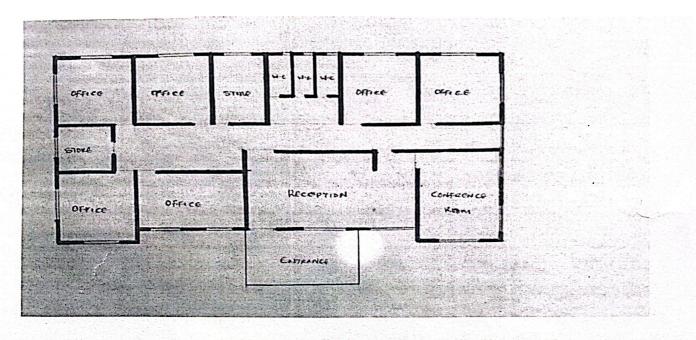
FLOOR PLAN SHOWING ADMINIISTRATIVE BUILDING OF CASE STUDY ONE LOCATED AT IBADAN OYO CENTRAL ABATTOIR
